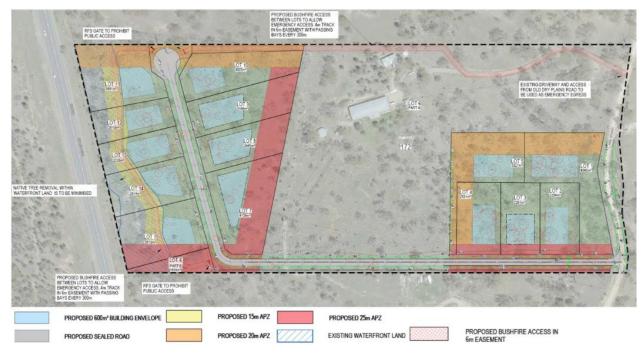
Subdivision Plan with APZ's to achieve BAL 29.
